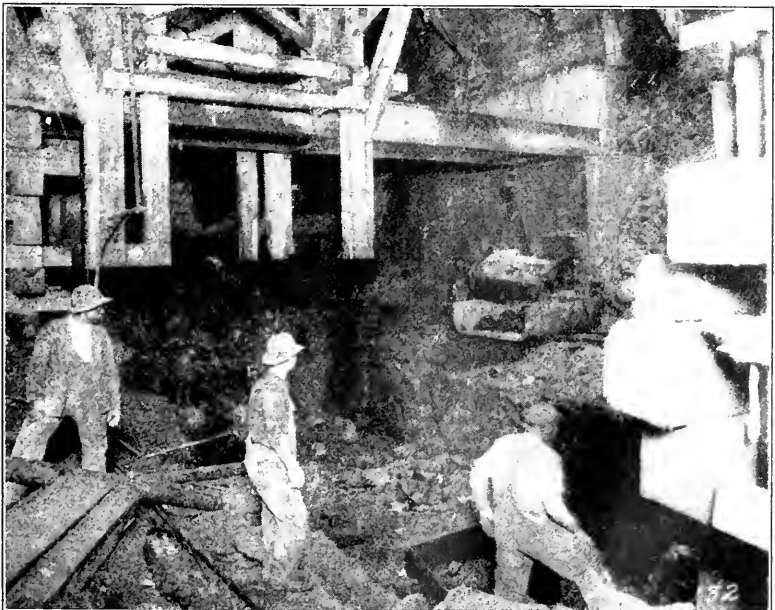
TOWER SUPPORTED WHILE EXCAVATION FOR DEEPER LEVEL IS BEING MADE UNDER IT.
